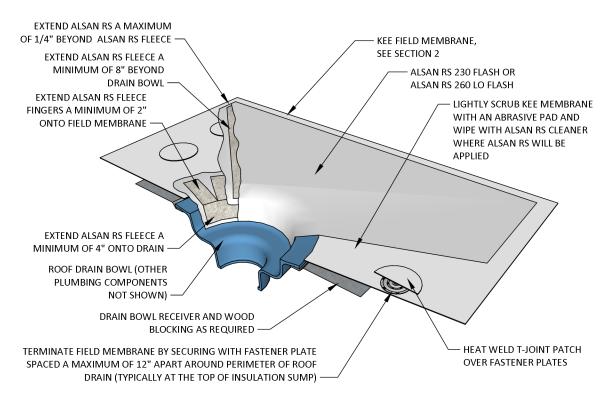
ALSAN® RS Flashing at Roof Drain
